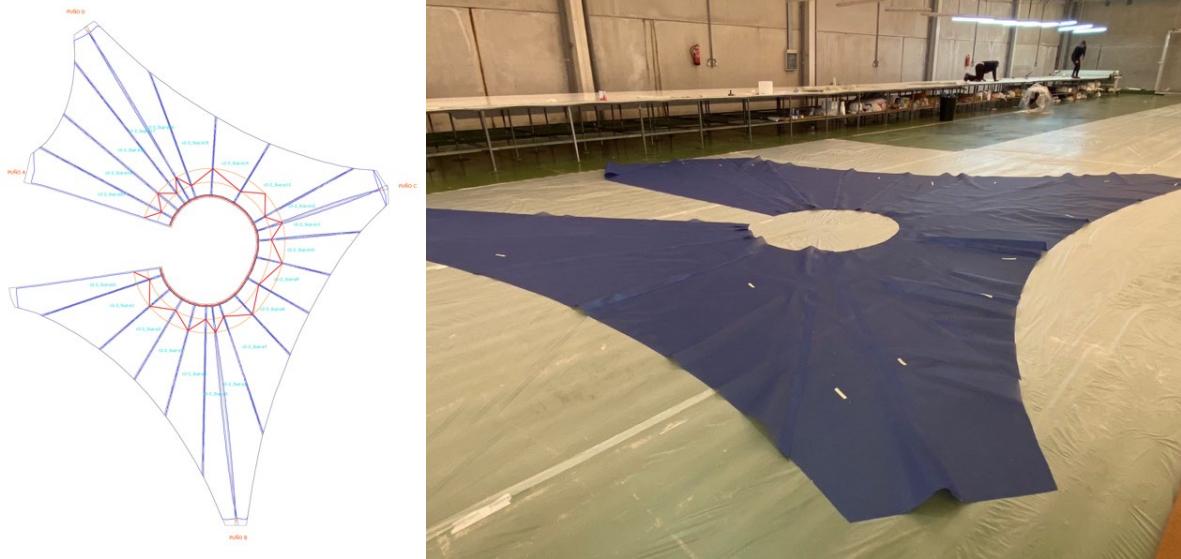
One of the conoid's patterning layout and its execution on the workshop
